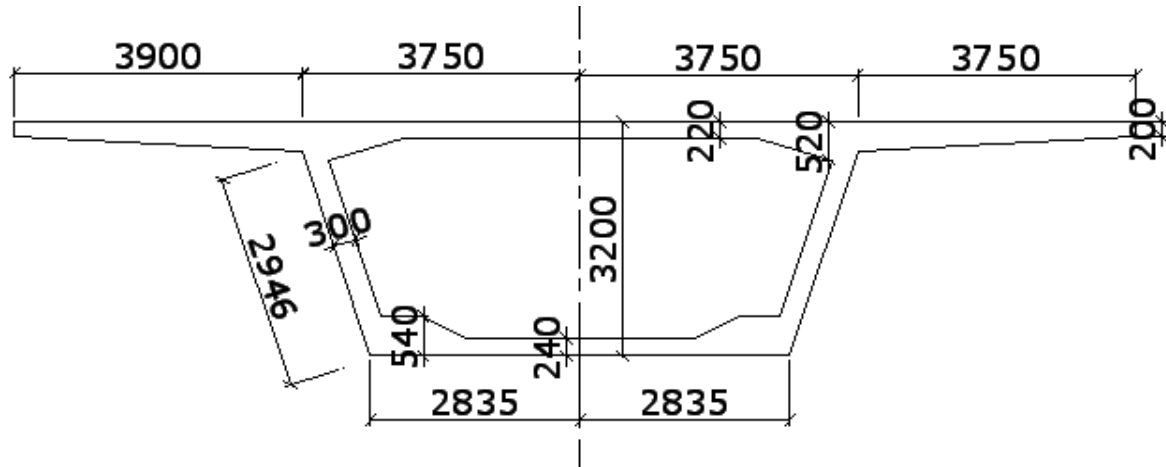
Cross section of single cell precast pre-stressed box girder
